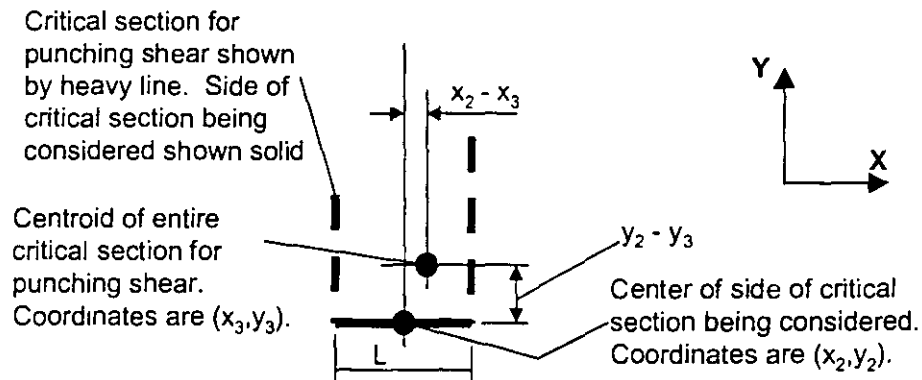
Plan View For Side of Critical Section Parallel to X-Axis
